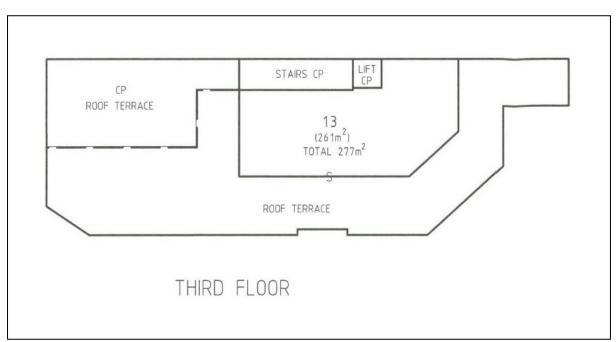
Strata Plan demonstrating the configuration of the rooftop terraces at No. 140 Percival Road, as approved under DA200200184.03
